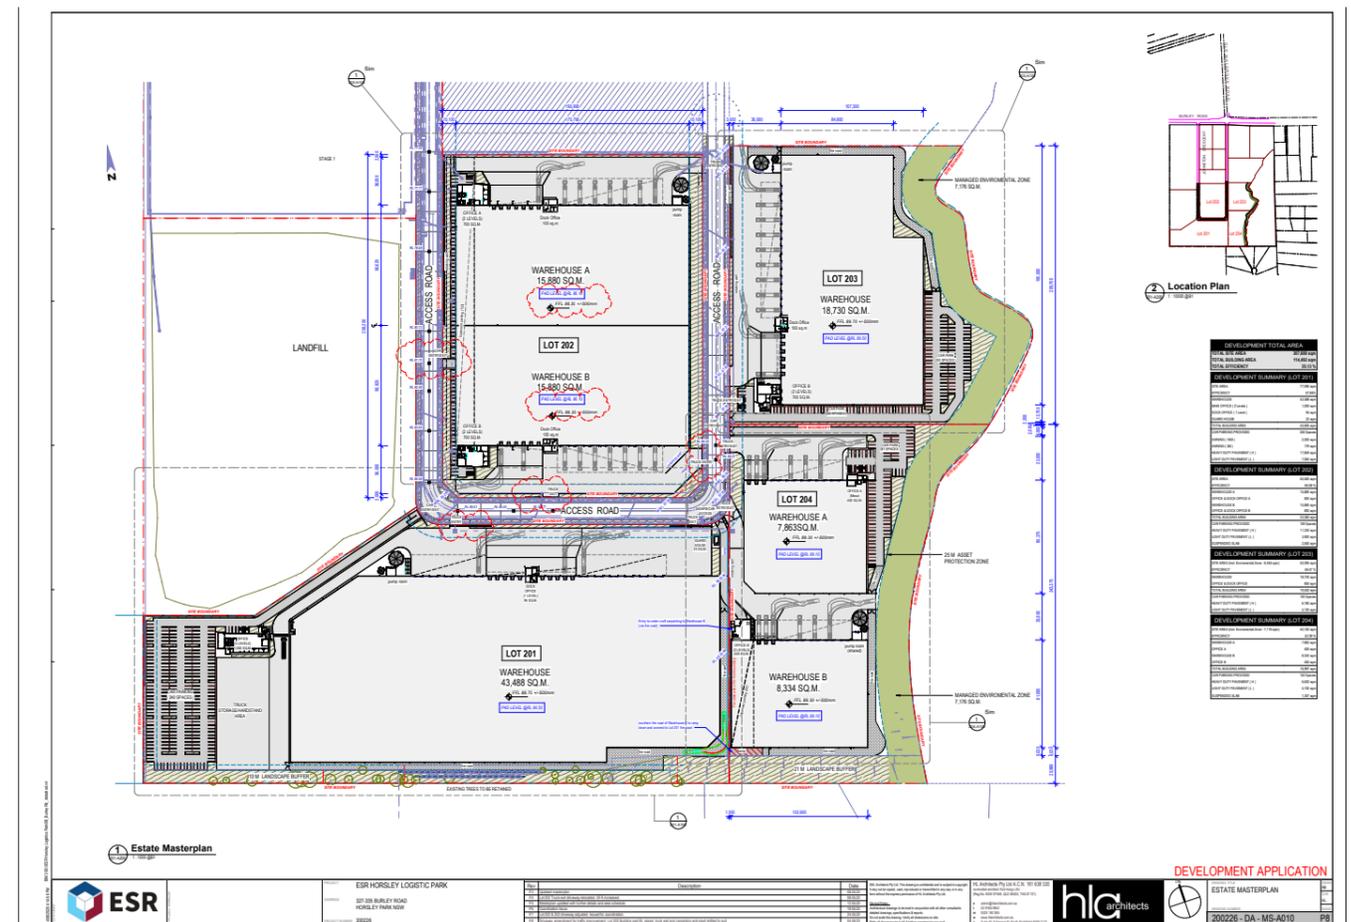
Proposed ESR Masterplan (Source: HLA Architects)
